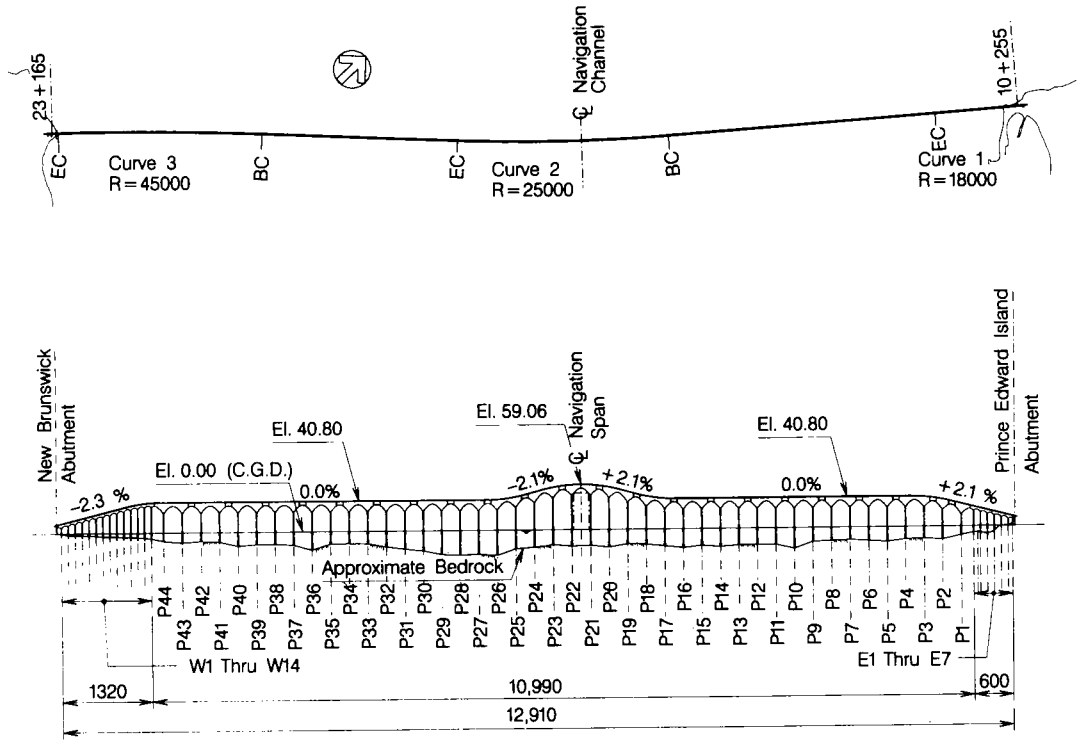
Bridge profile: top, plan; bottom, elevation.
